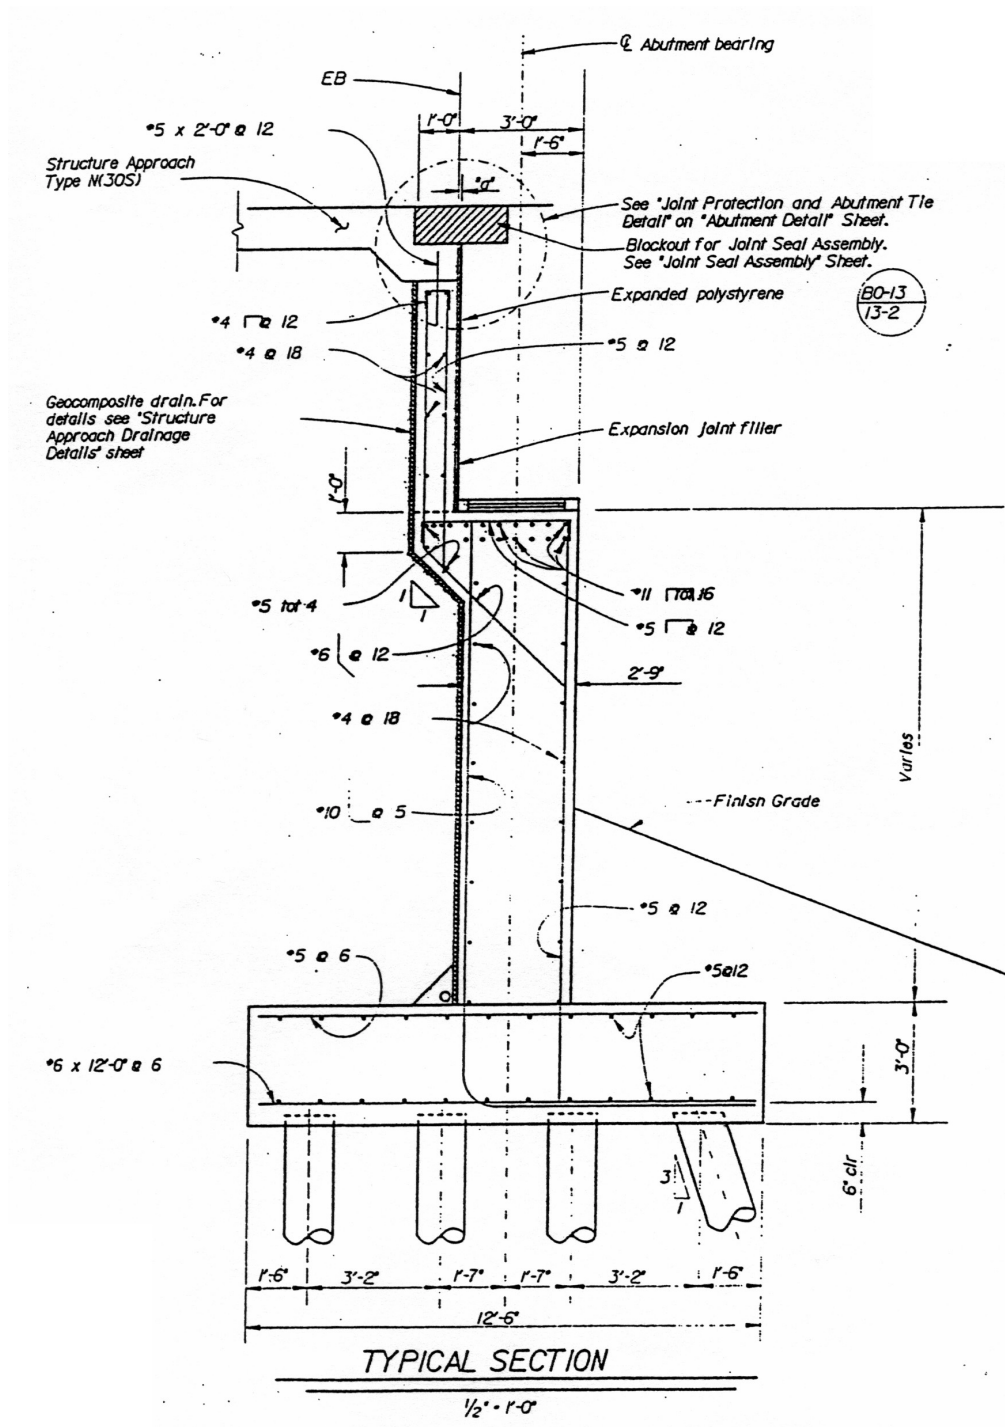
Typical Abutment Section at West Street On-Ramp
